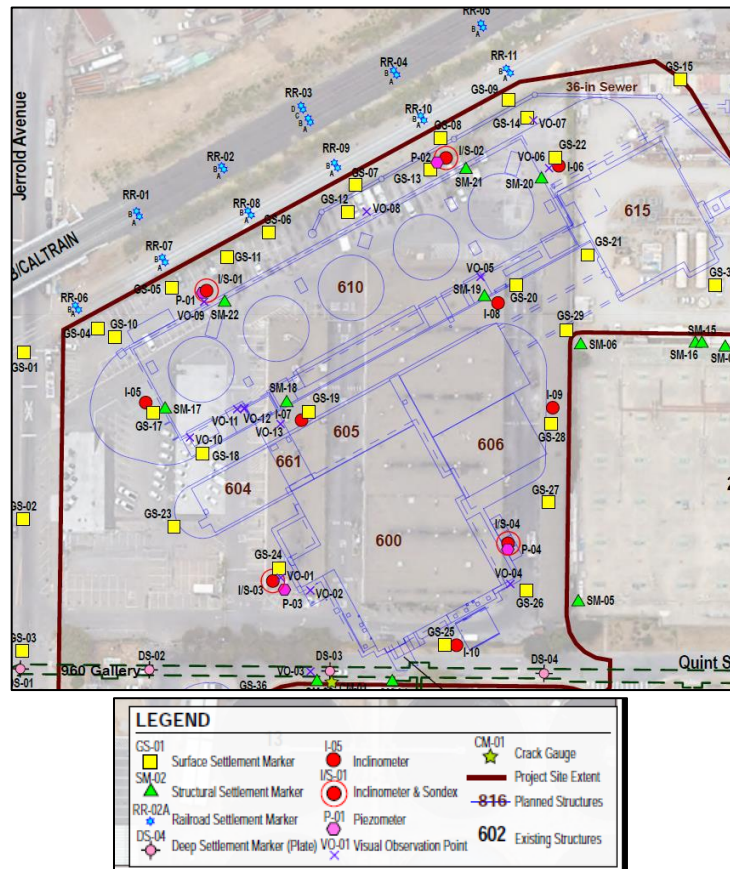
Instrumentation Plan (Terra Engineers, Inc.)
